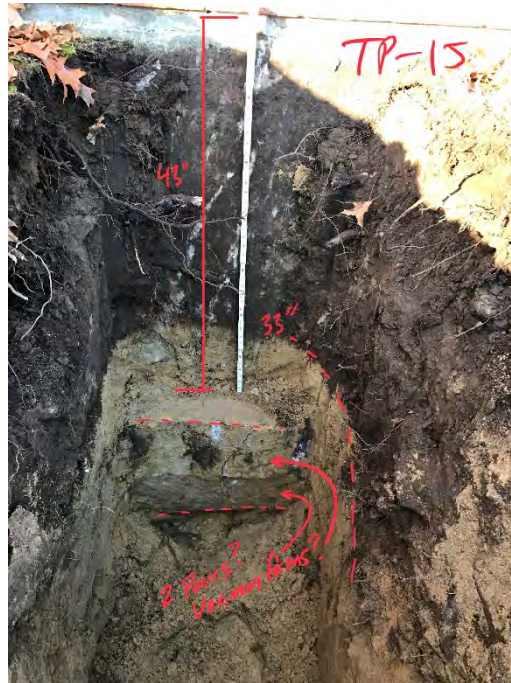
View of test pit HA21-TP15, exposing existing building foundation adjacent to the proposed Building Addition.
